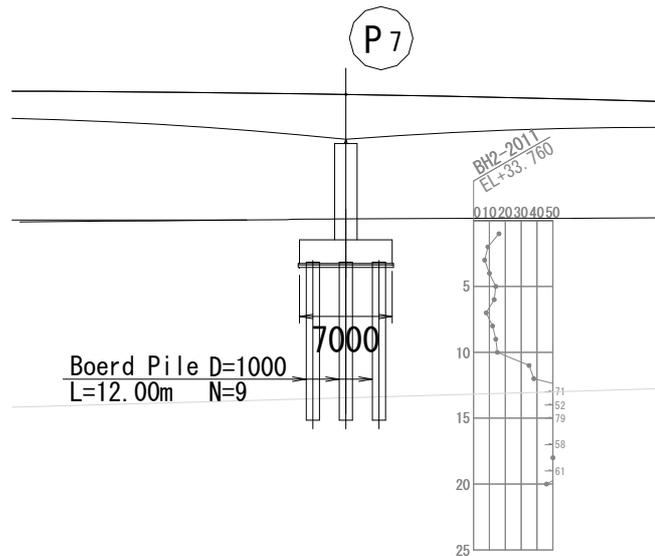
Cast-in-place Concrete Pile (P7)
